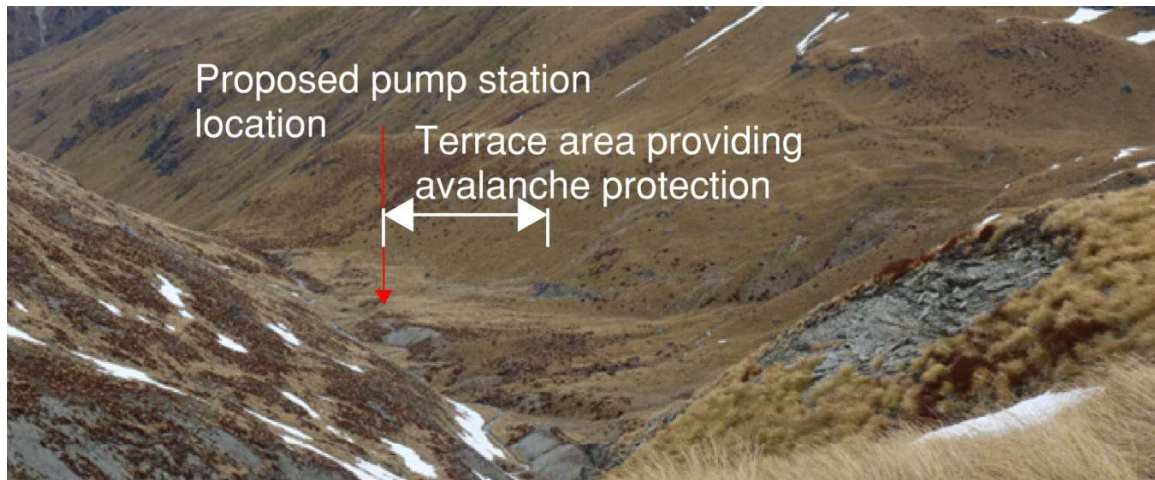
Photograph showing avalanche run out distance to proposed pump station location
